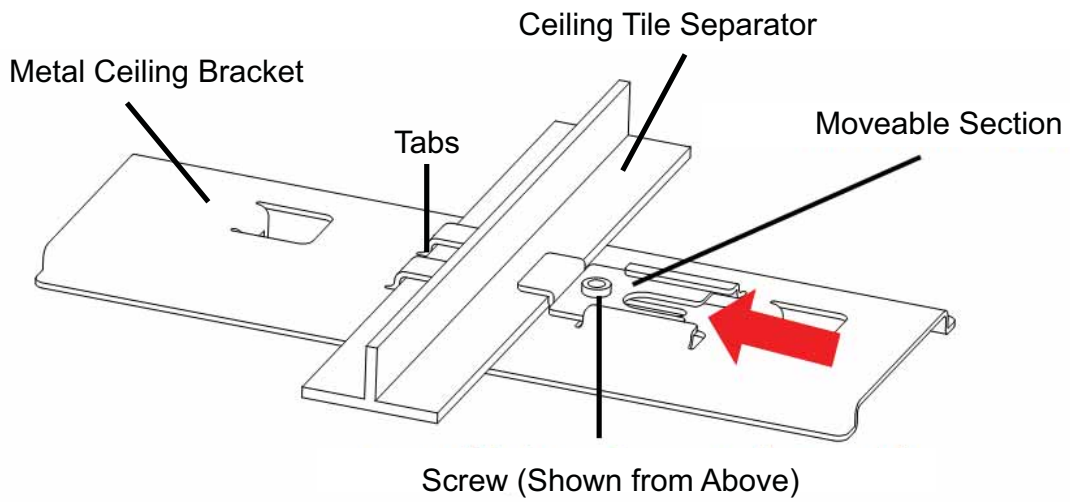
Securing the Metal Ceiling Bracket to the Ceiling Tile Separator
